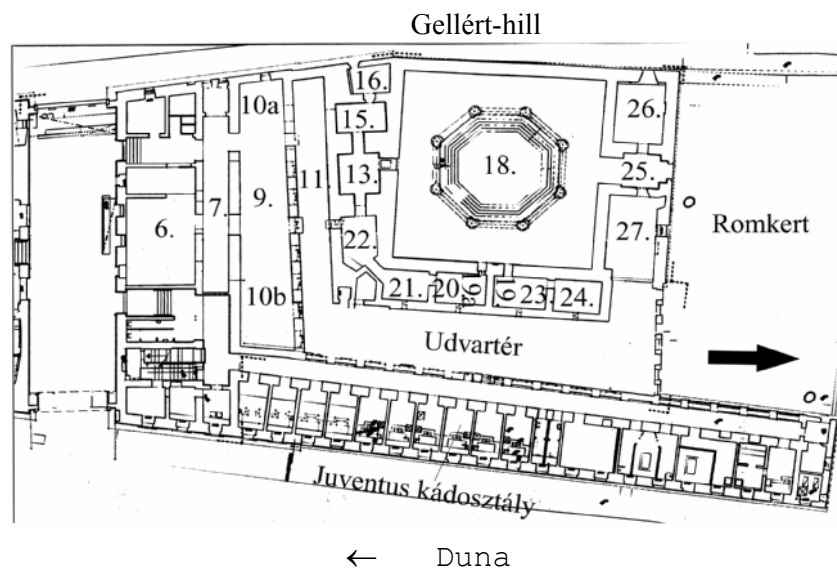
Ground plan with numbers of the rooms (after Ákos Kaszab designer's survey sketch)
